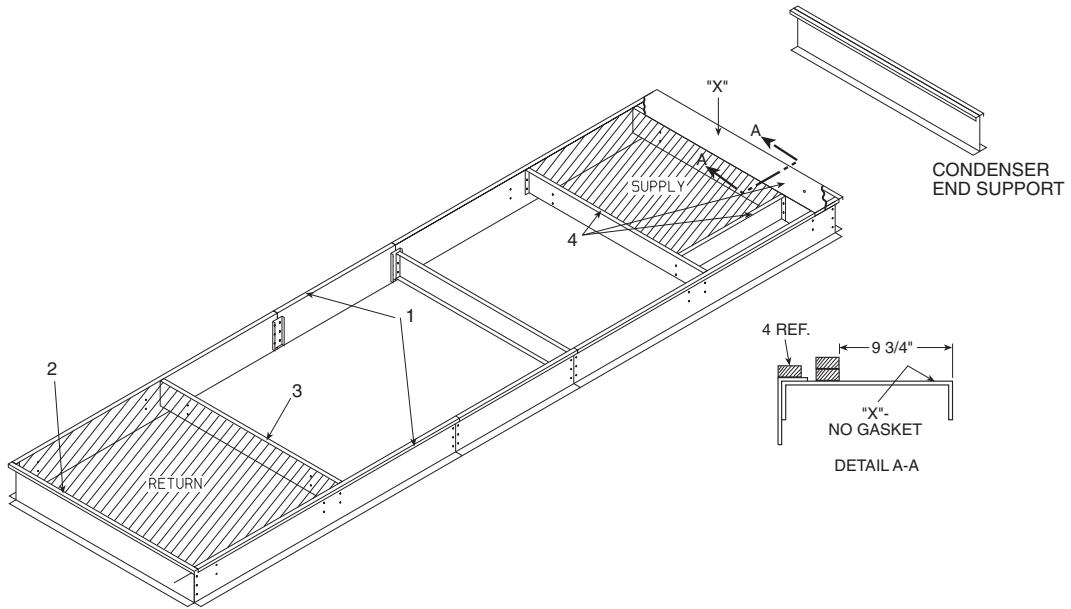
Gasket Location on Roof Curb (Size 070-100 Units)
